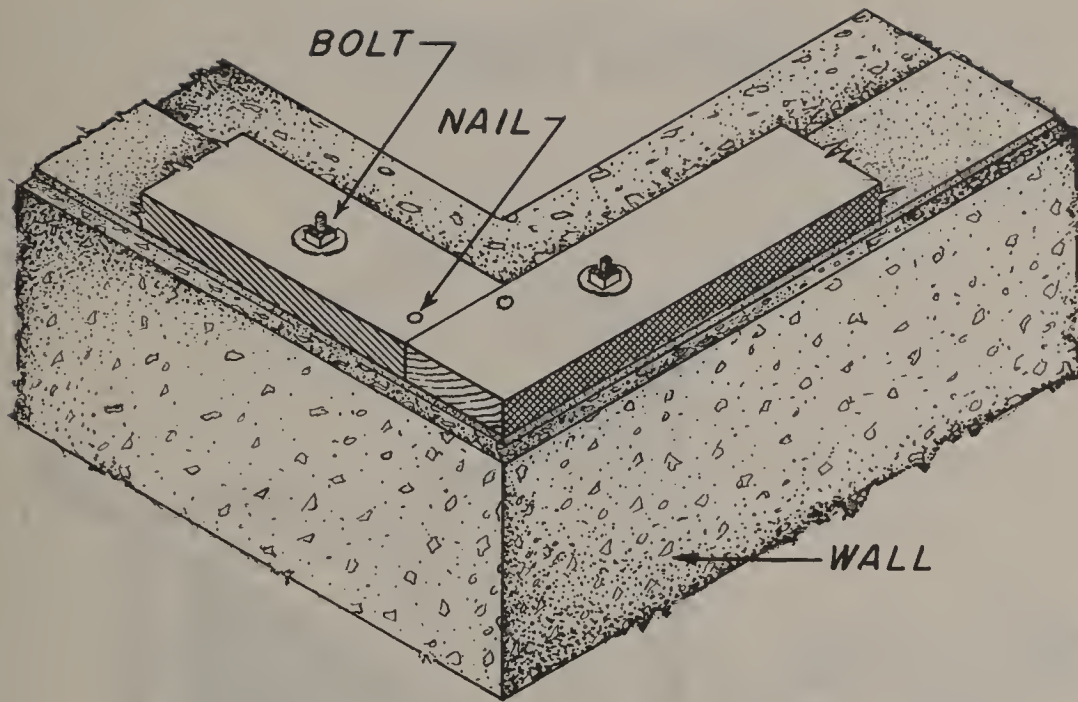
Sill. Adjoining pieces toenailed with two tenpenny nails.
